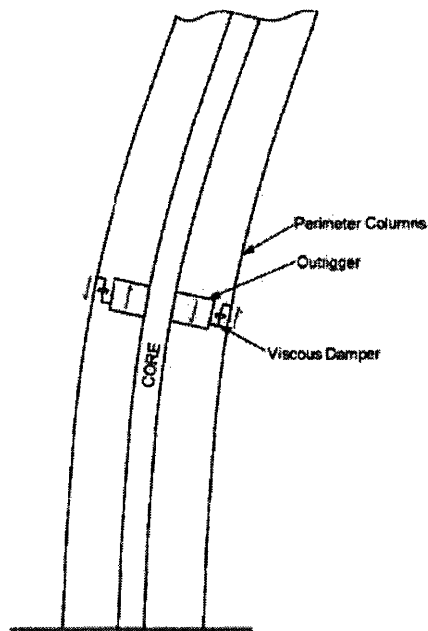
Damped outrigger concept (Smith & Willford, 2007)
